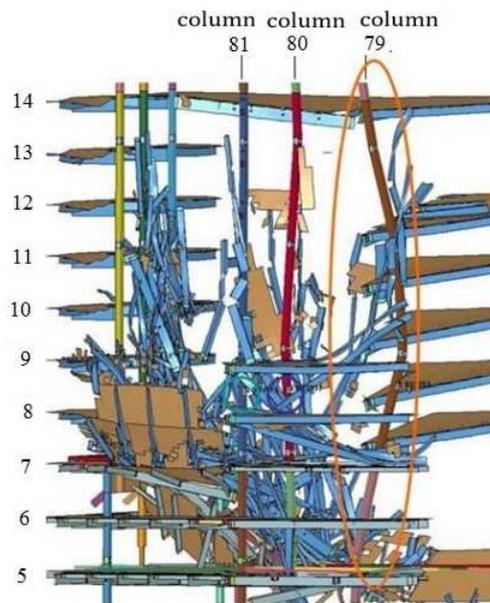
The bend of column 79 to the east, when viewed from the southeast
